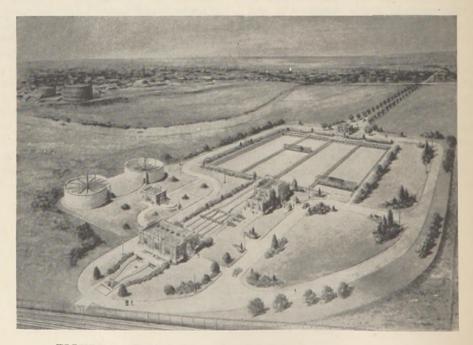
General view, Joint Meeting sewage treatment plant.
